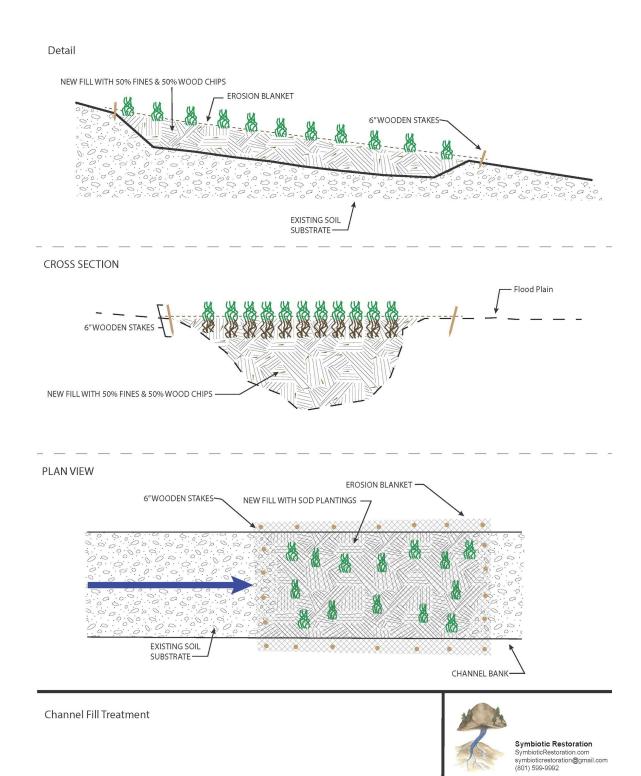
Schematic drawing showing the typical cross-section and plan view for mechanical full channel fill with 50/50 wood chips and soil mix, including plantings and erosion control
